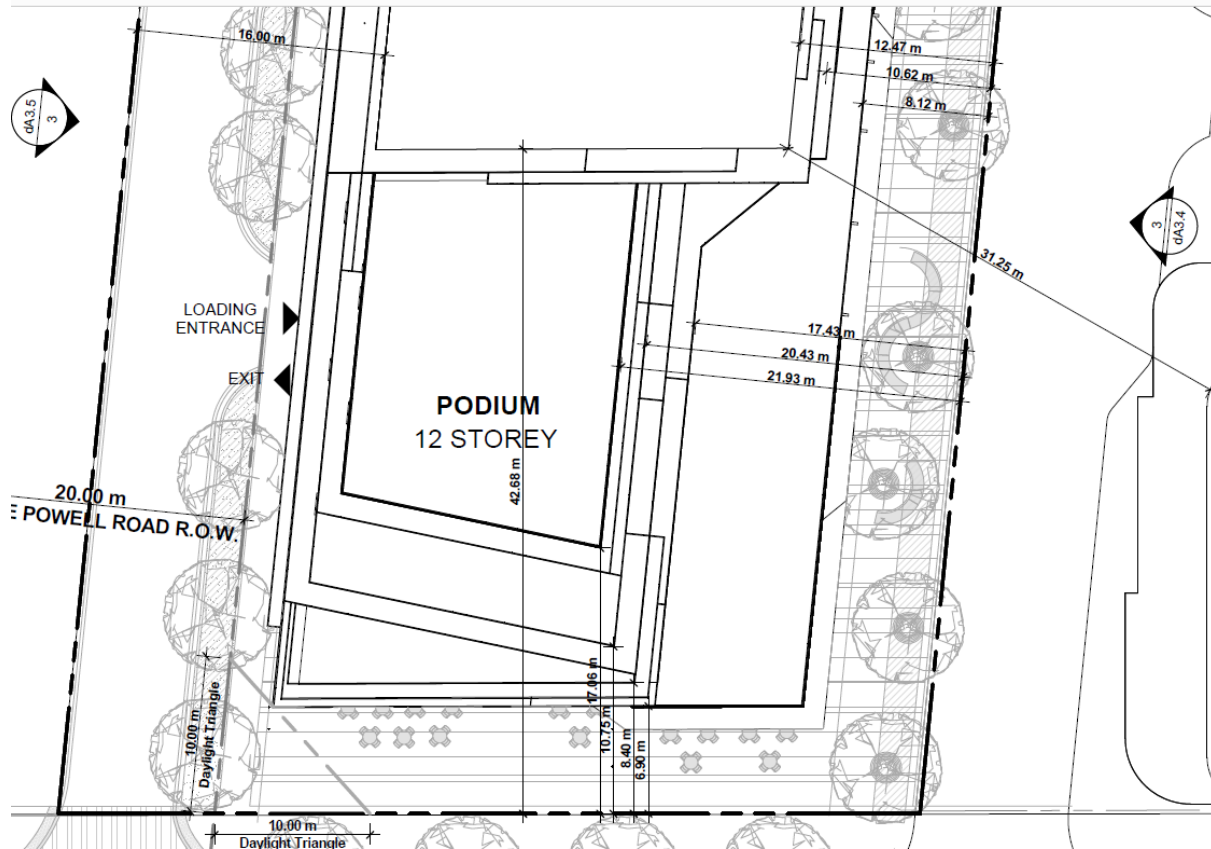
Site Setbacks - Building A (Source: Architectural Drawings, p. 7)
